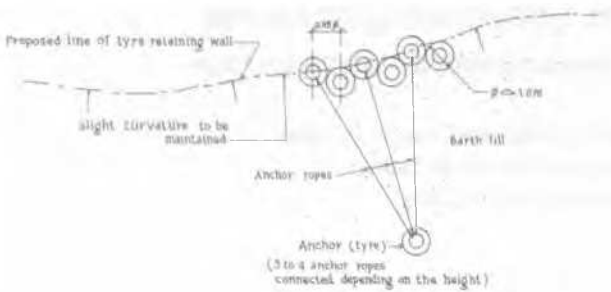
Plan view of Anchor and Facing Tyre Arrangement
